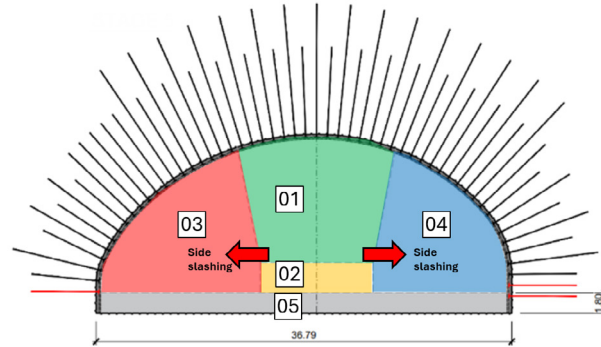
Cross section excavation stages and side slashing for stages 3 and 4.
